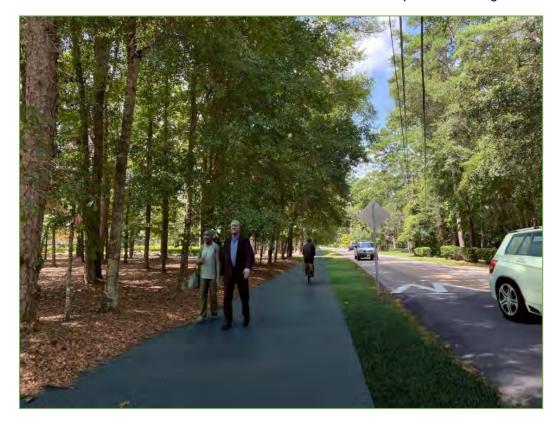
Market District Connection: Live Oak Plantation Road – Existing Conditions
